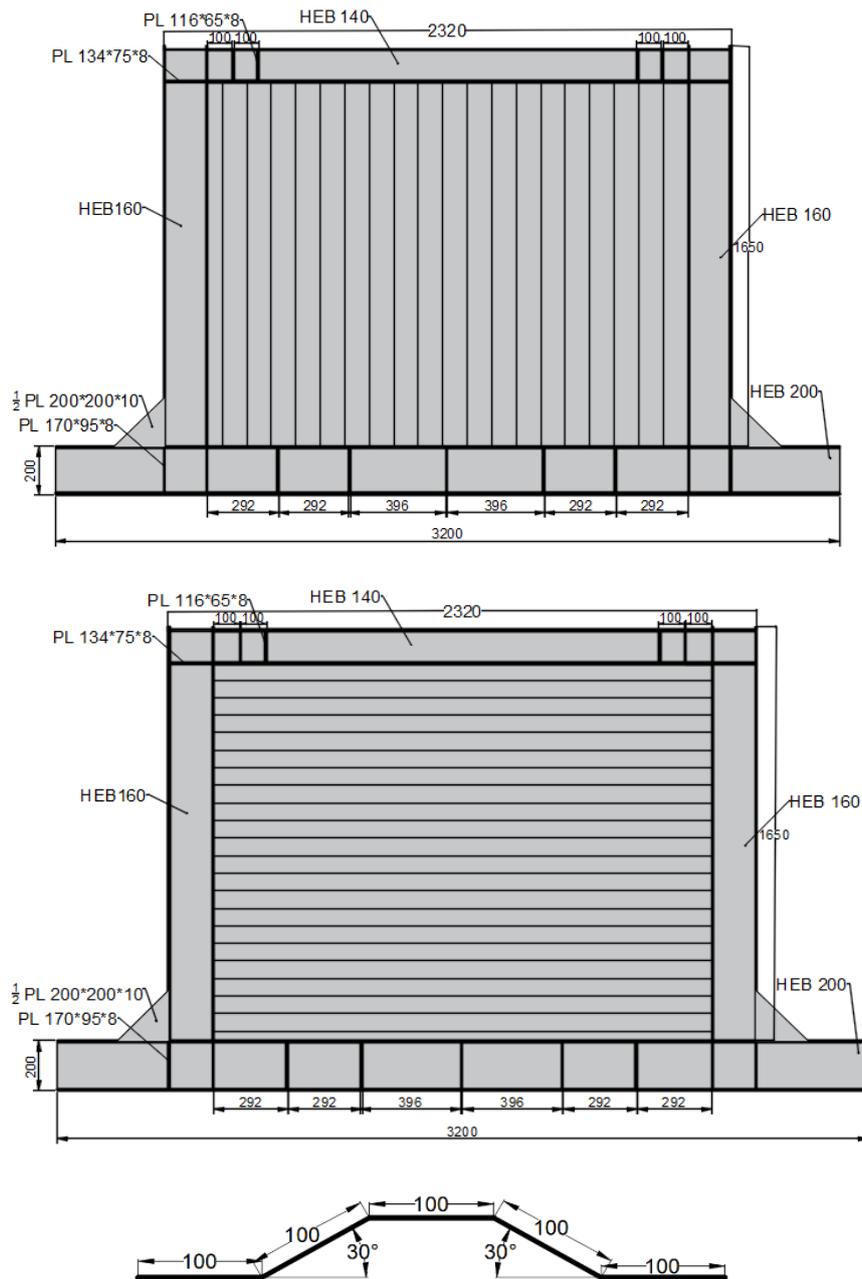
The details of the corrugated plate (mm) and the specimens [5]
